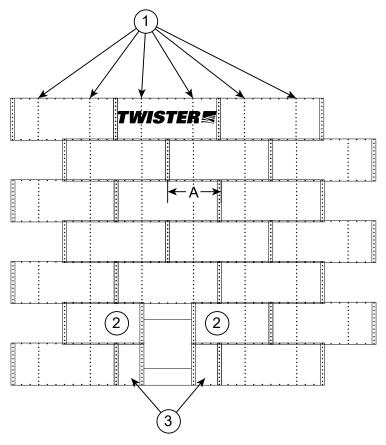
Wall Sheet Caulking Detail (inside view) — Metric
